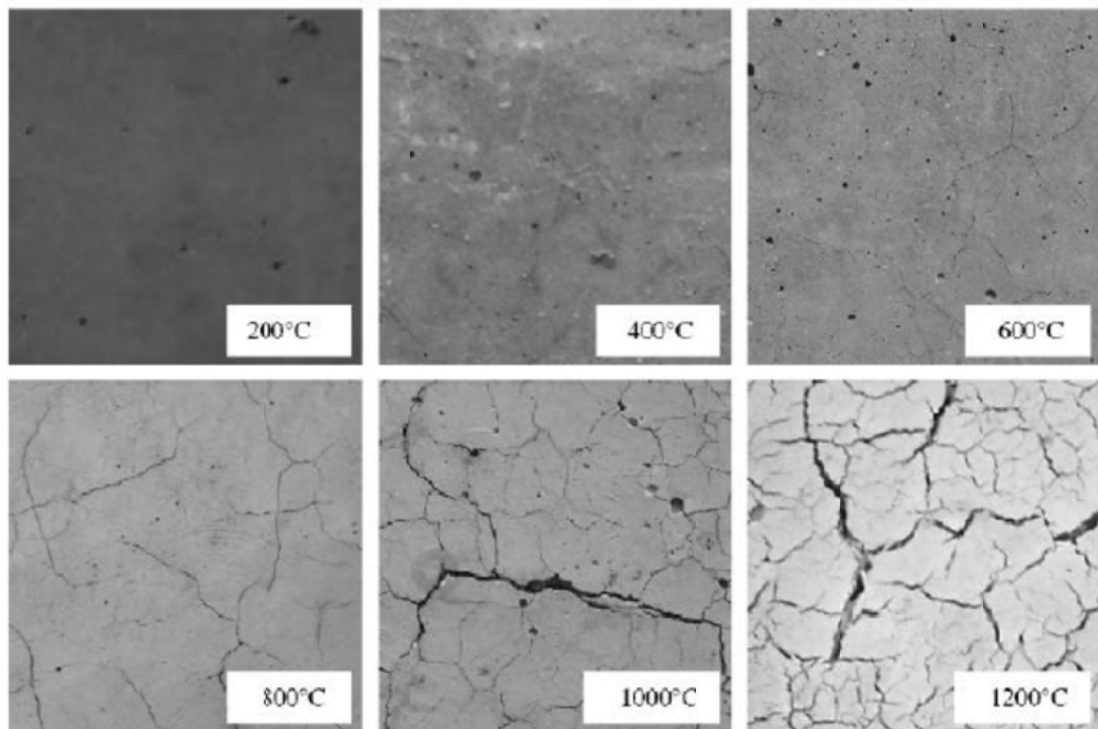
Characteristic of Surface Concrete Crack under Different Fire Exposures [18]
